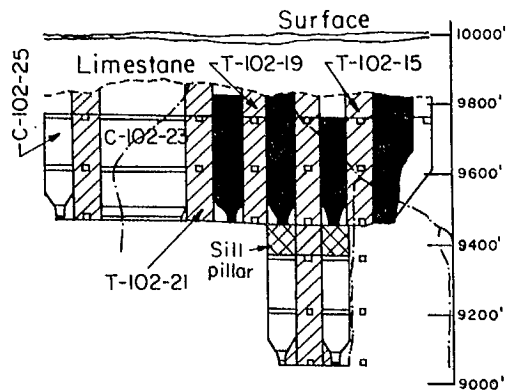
A typical section showing stope C-102-23 and surrounding mine workings (mined out stopes in black)
